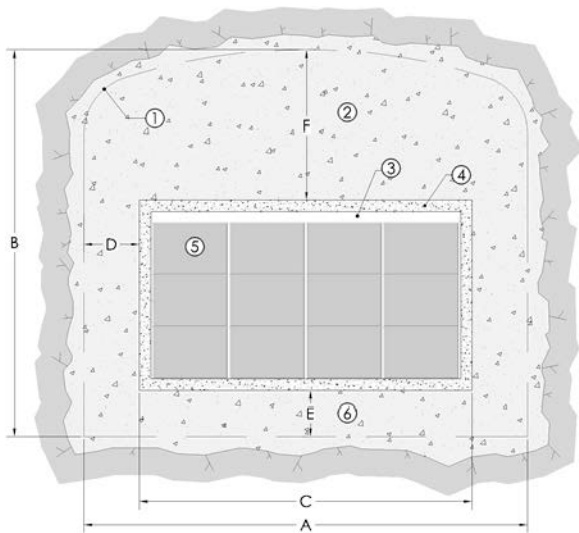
Schematic cross-sectional layout of the BHK vault for metallic waste (from Elfving et al. 2013).
